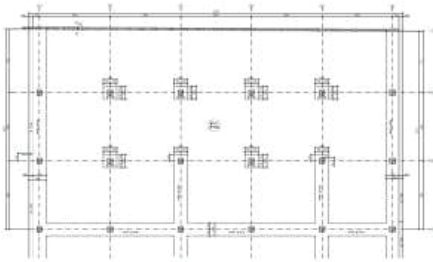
Plan of one section of the slab in a shopping mall [10]
